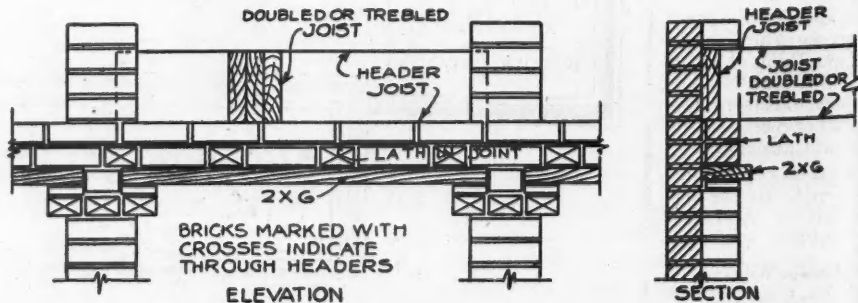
Above: Joists Are Spaced Irrespective of Location of Pilasters.
